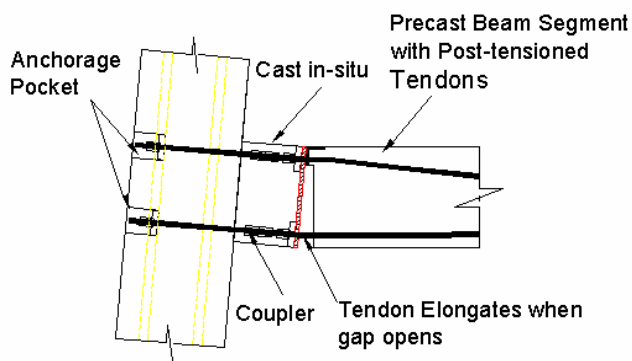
Potential solutions for connection precast prestressed beams to columns.
